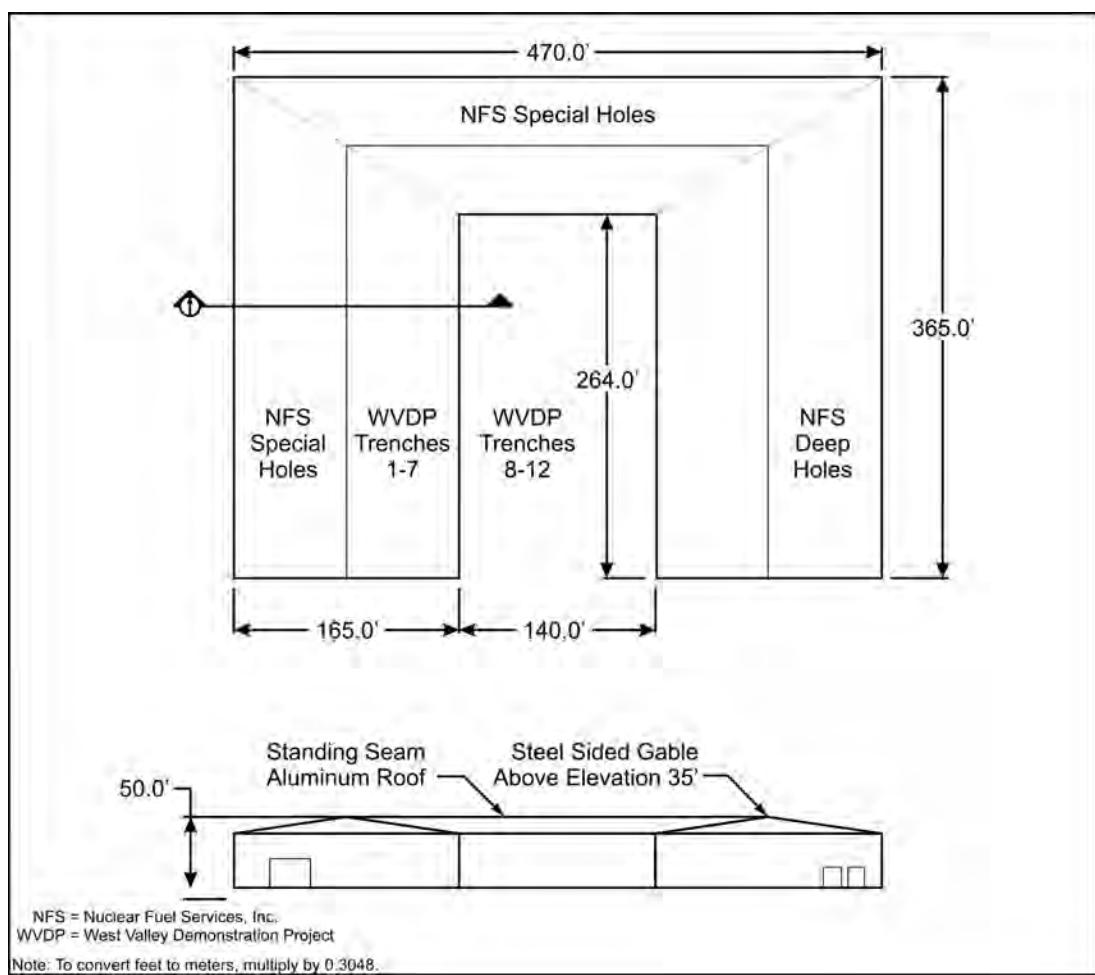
Conceptual NRC-Licensed Disposal Area Environmental Enclosure – Plan and Elevation
